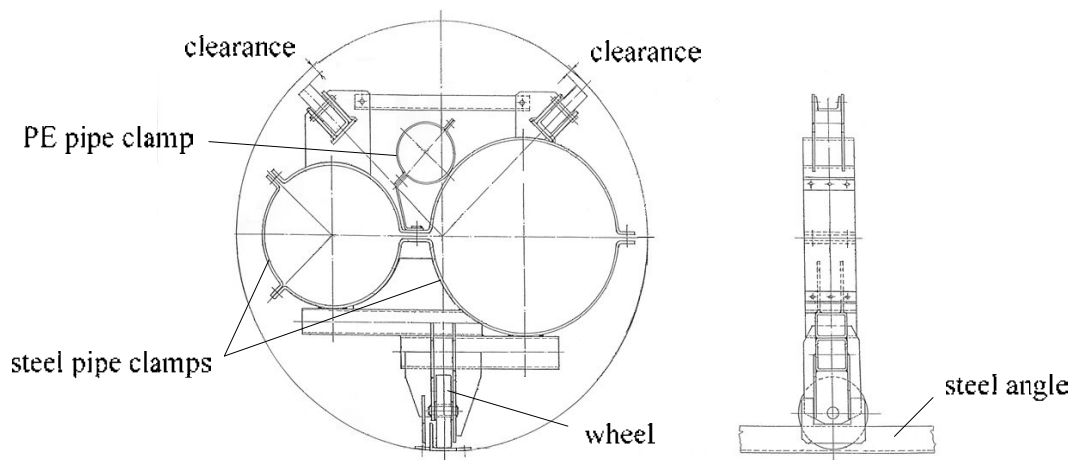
Improved design of the wheel support with clamps. Single main wheel rolling on the steel angle rail and two side wheels designed to establish direct contact with the walls of the tunnel.
